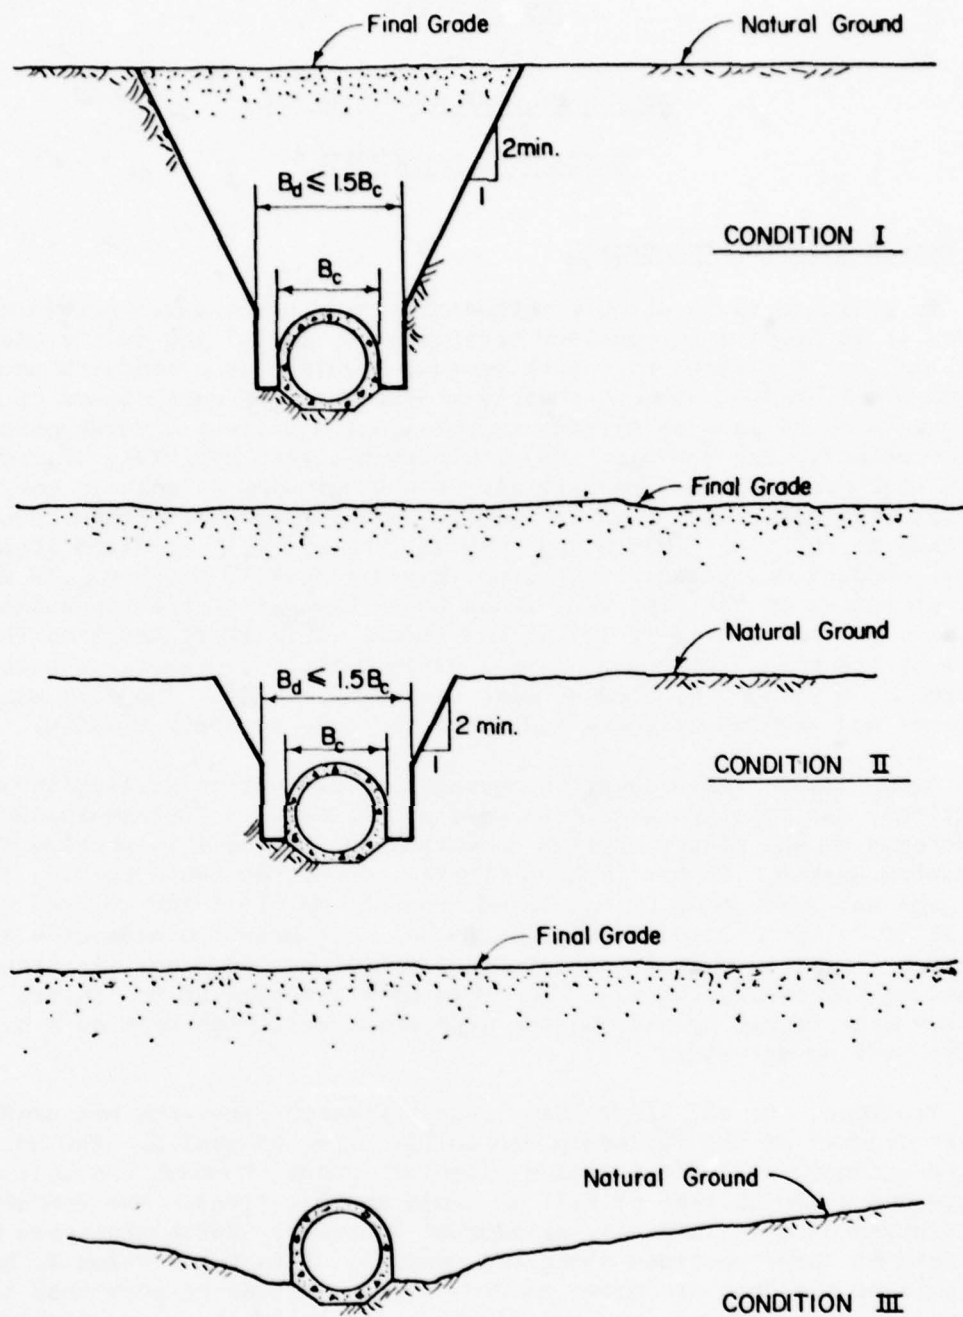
CONDUIT LOADING CONDITIONS CONSIDERED BY CORPS OF ENGINEERS DESIGN MANUAL (After Dept. of the Army, 1969)
